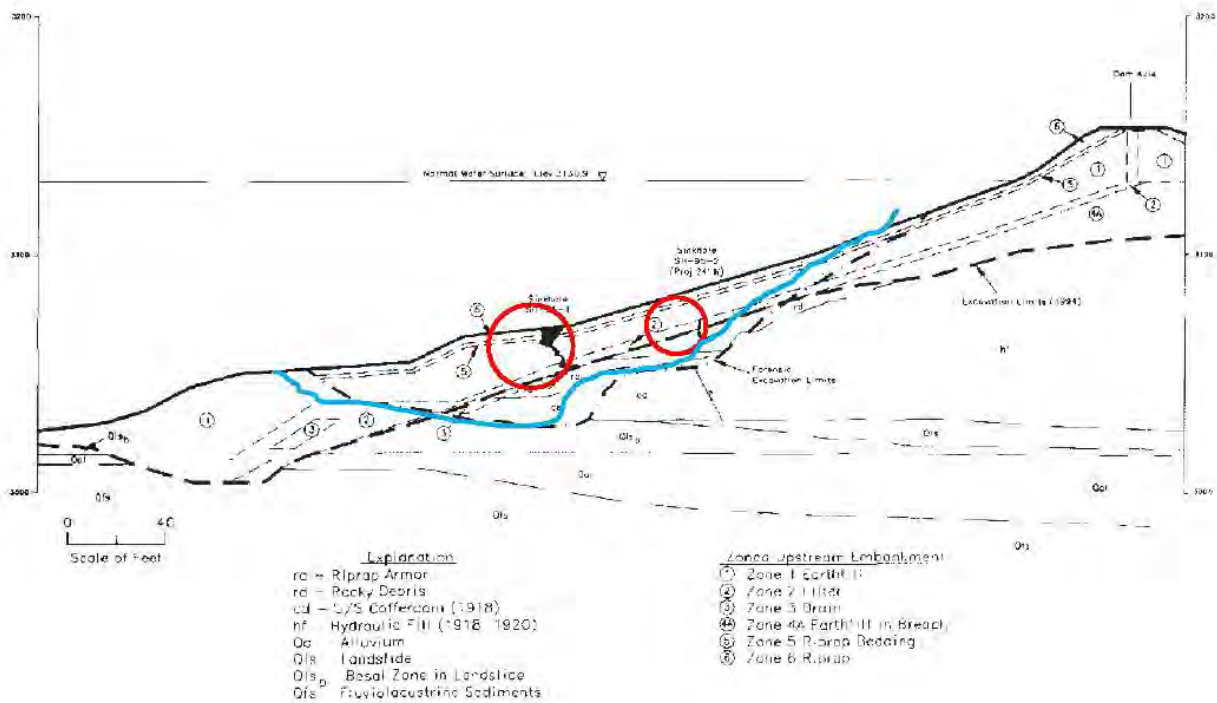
1995 dam raise and upstream slope modifications. Depth of forensic excavation (blue line) and sinkholes that developed upon refilling (red circles). Limits of 1995 construction excavation are shown with the dashed, black line.
